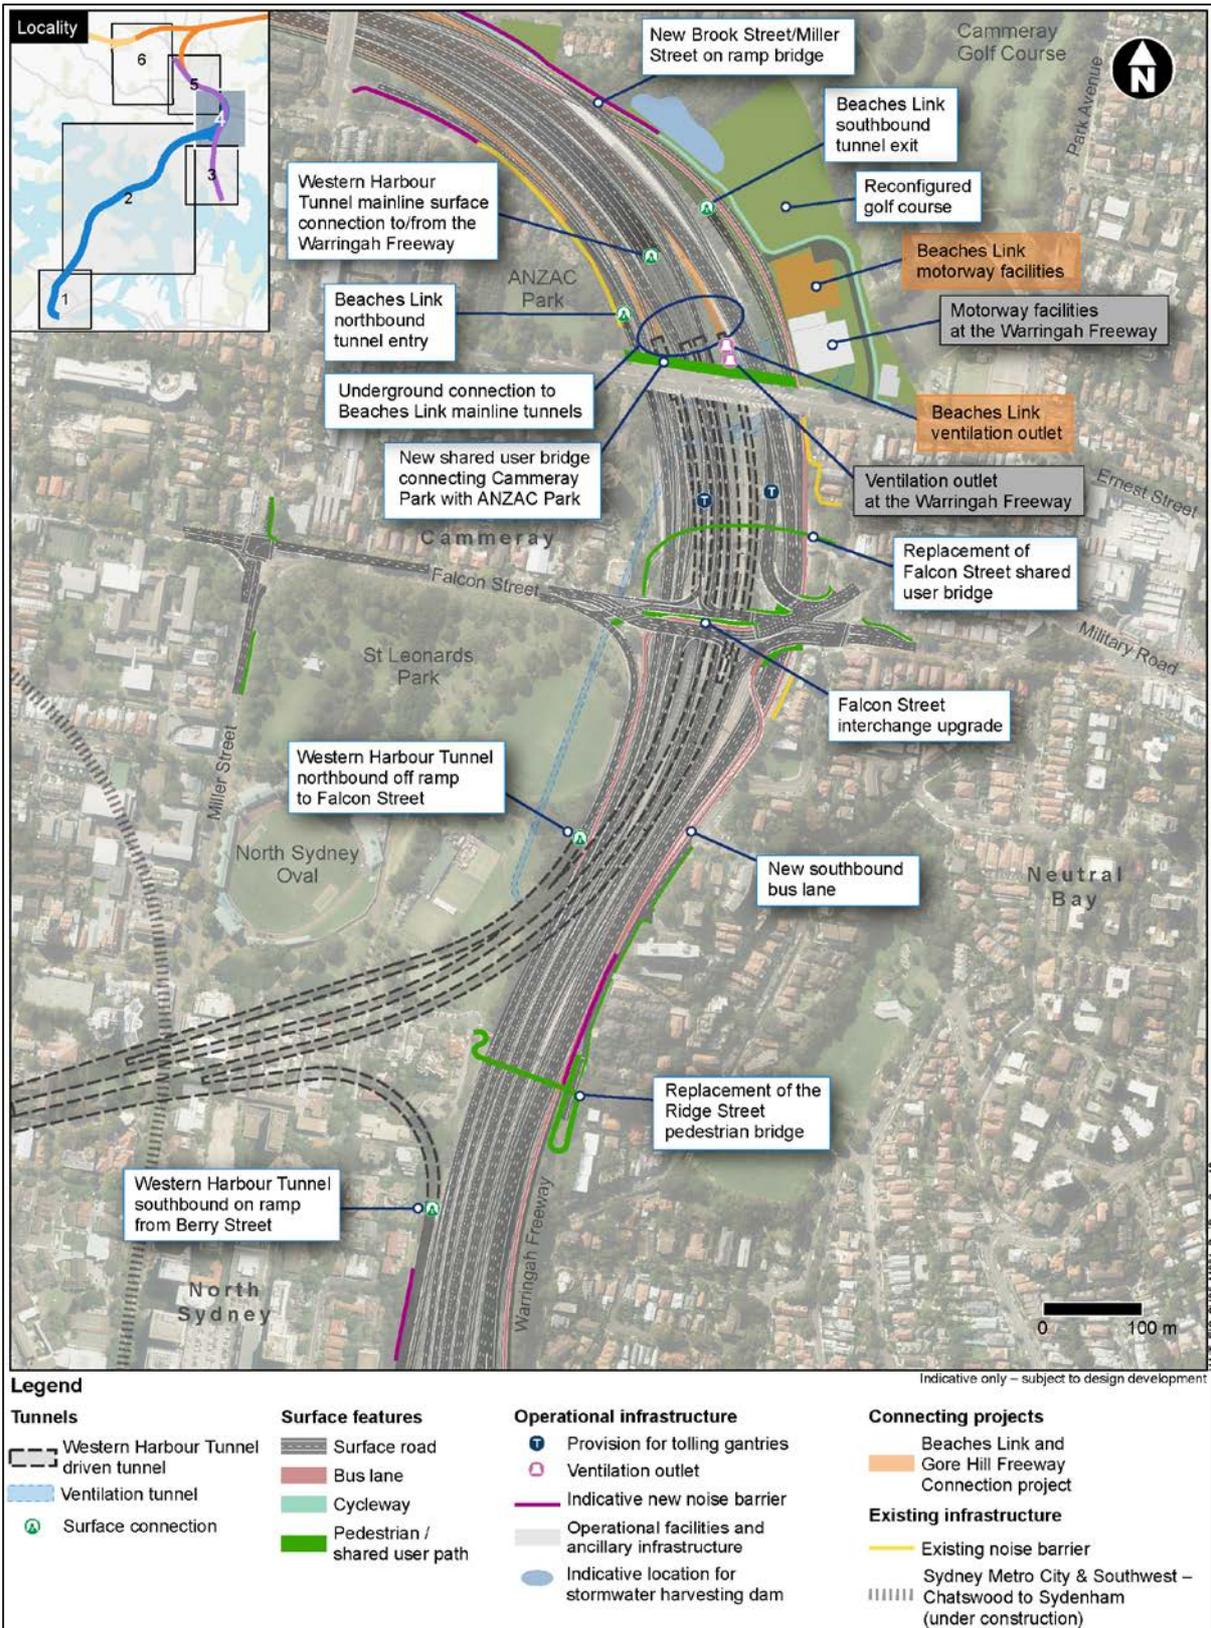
| Project Layout: Mainline surface connection to Warringah Freeway (Source: EIS)
